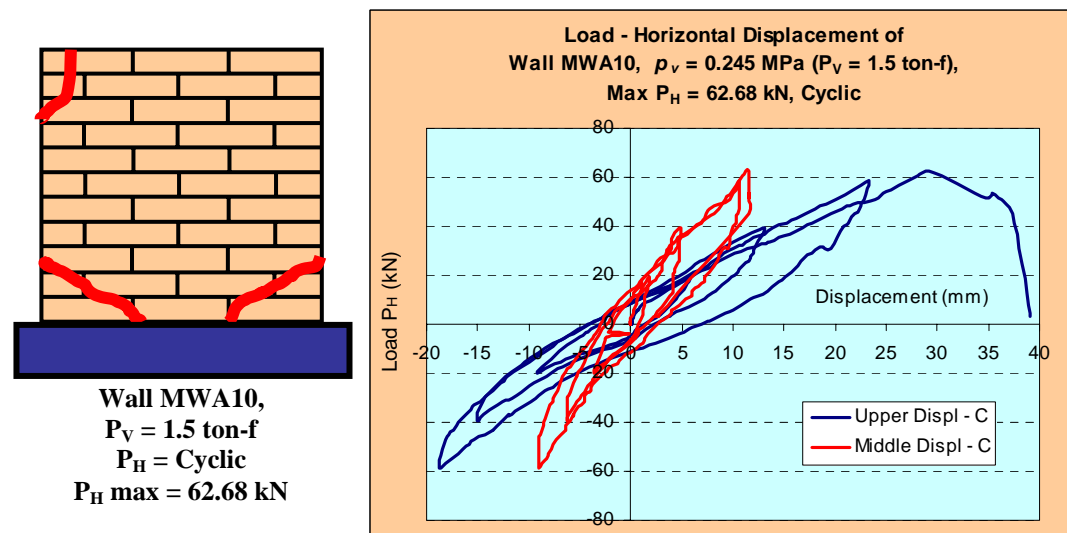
Failure pattern and load-displacement of wall MWA10
